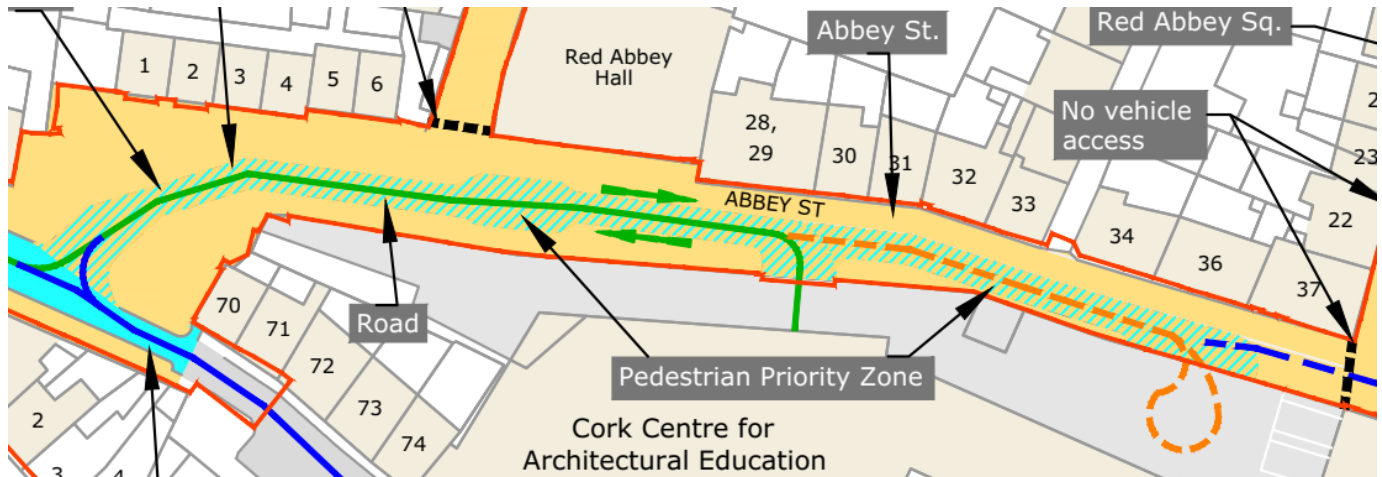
Section of Two-Way Carriageway on Abbey Street
